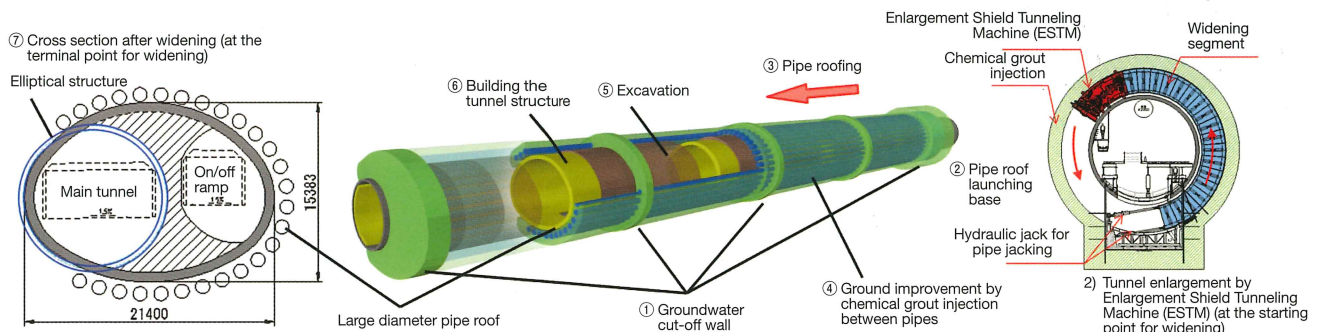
Fig. A new underground large diameter tunnel widening technology that combines Enlargement Shield Tunneling Machine (ESTM) and Large Diameter Pipe Roofing (LDPR)
